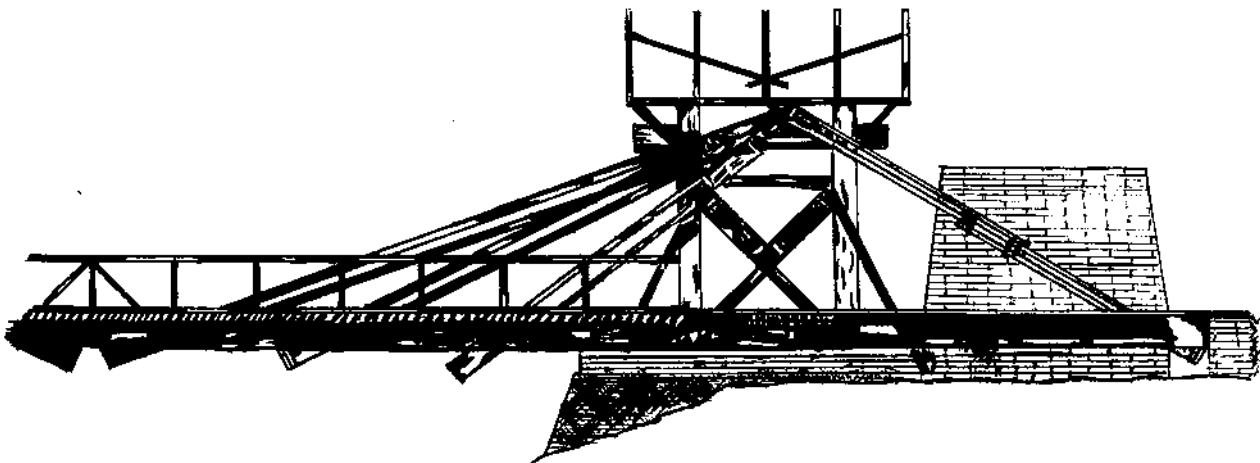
Löscher-type timber bridge. (Courtesy of the British Constructional Steelwork Association, Ltd.)
